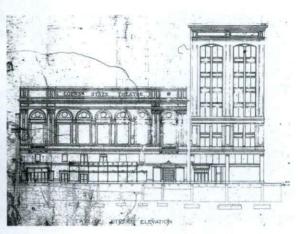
Warfield Theater Building. Original Taylor Street elevation (1 September 1920). Source: Building Permit Application #094075, plans: roll #8653, frame #353-9.
